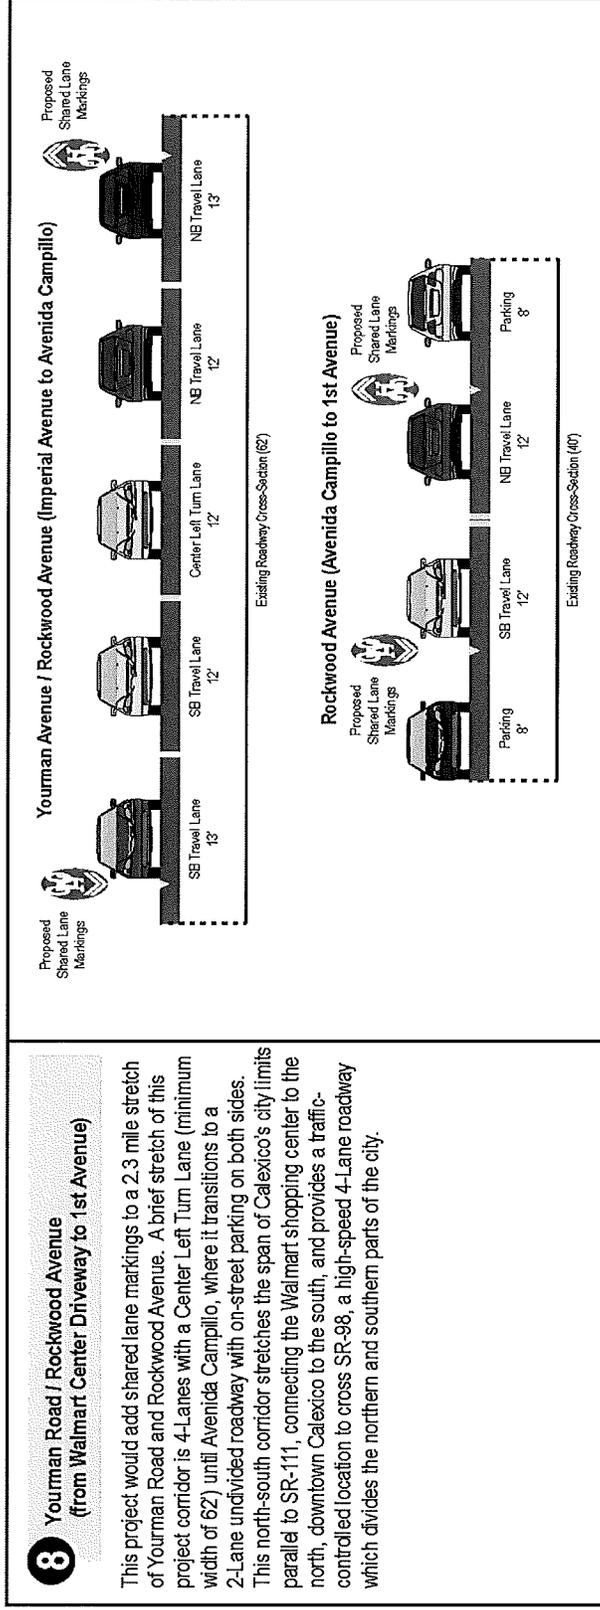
Project Sheet 8: Yourman Road/Rockwood Avenue
